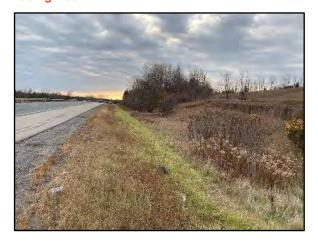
Ditching and drainage along Highway 401 right-of-way. Facing southwest.
